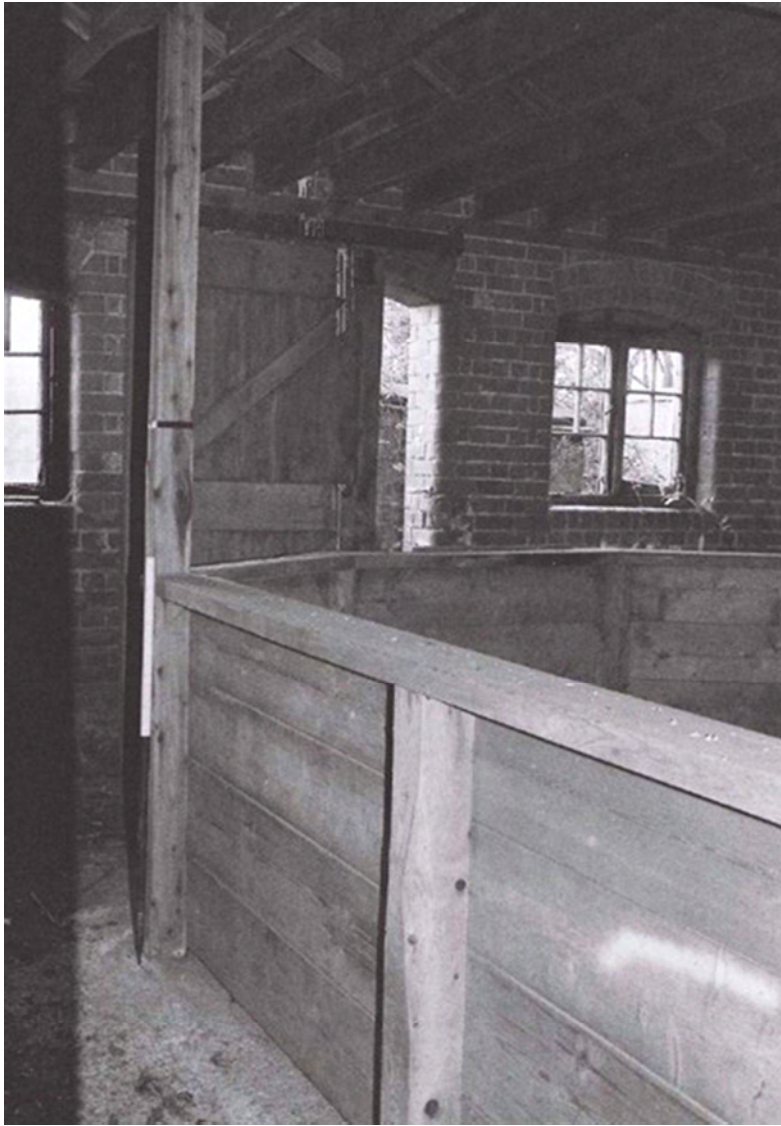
Dutch Barn: Interior – Ground Floor. Facing North.
